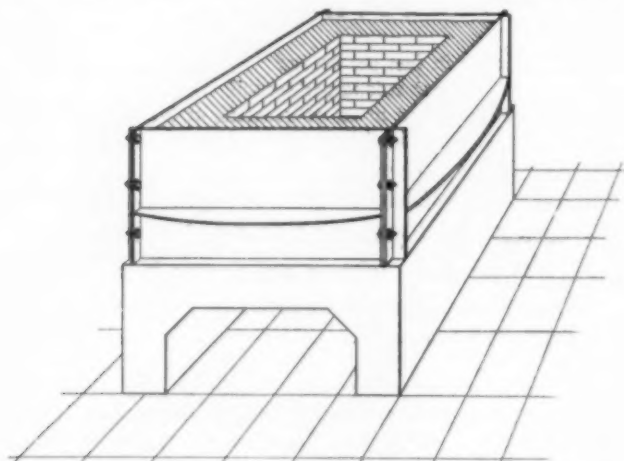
SECTION OF FURNACE BUILT OF CAST IRON PLATES ALSO ON TABLE OF A REINFORCED CONCRETE
